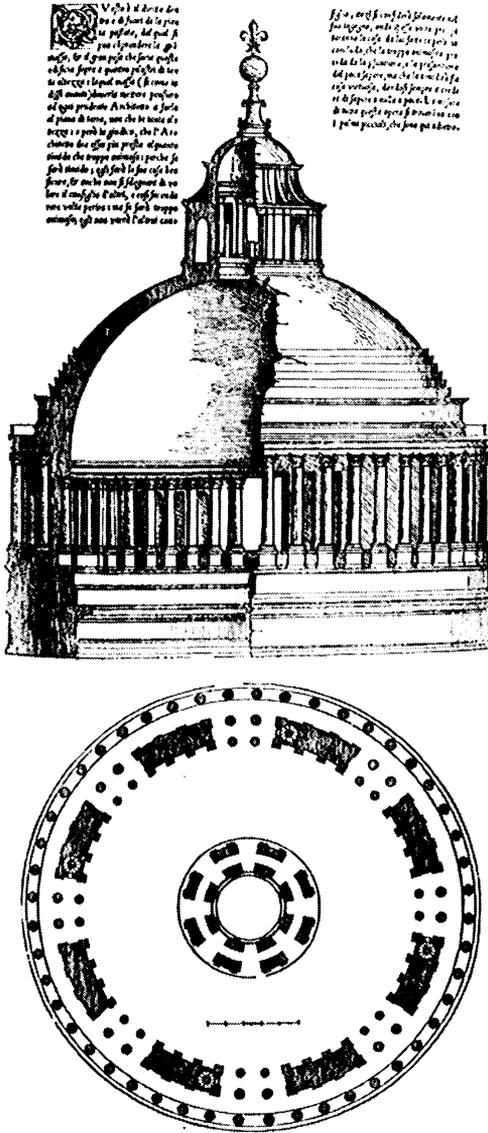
Sertio: Bramante's cupola Section and elevation ground-plan of drum and lantern
